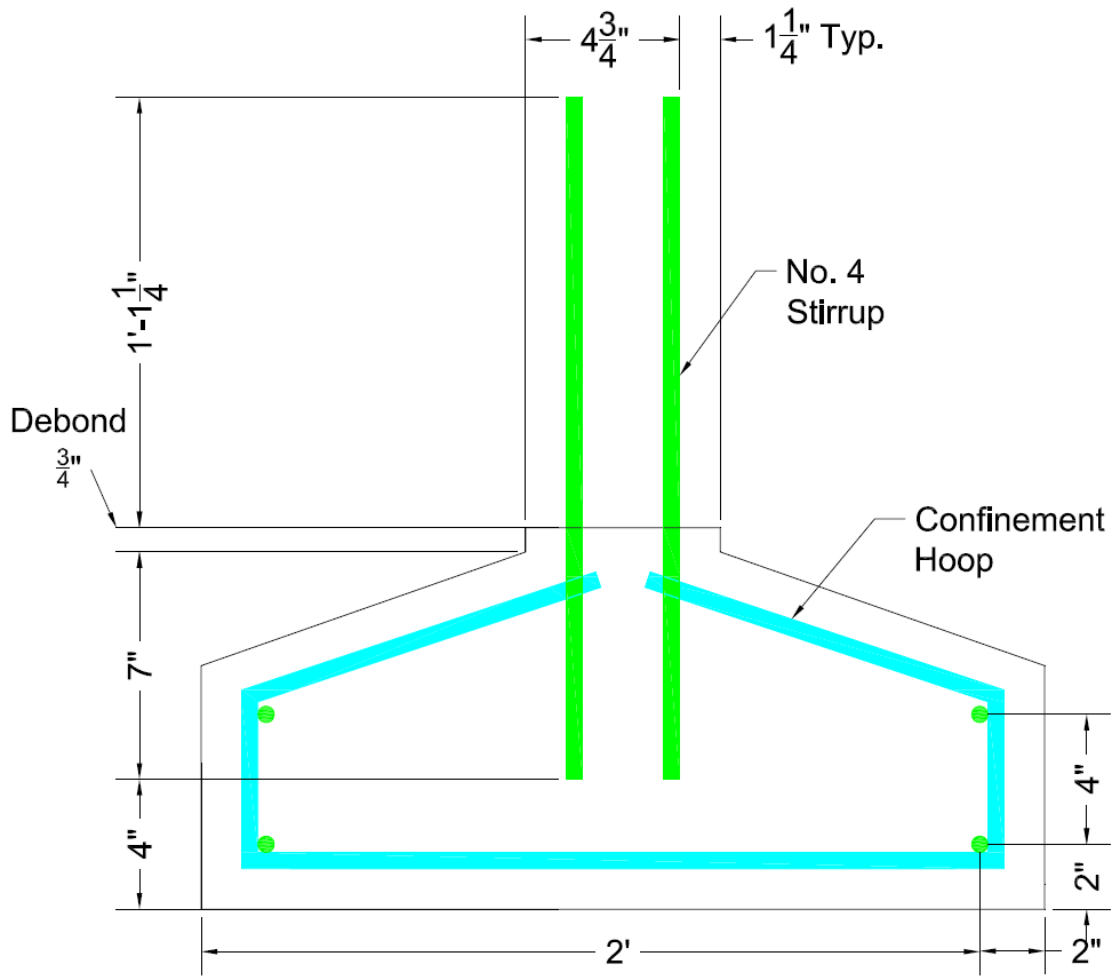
Cross-sectional view of typical M-shaped subassembly specimen.
